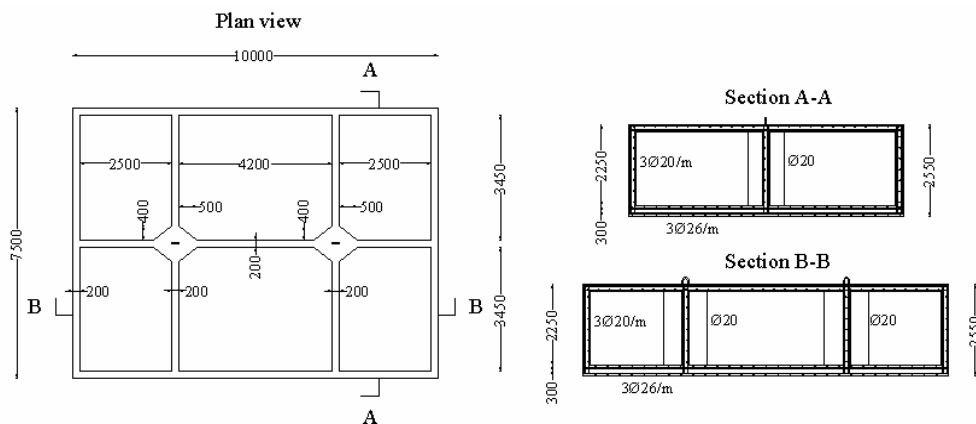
Plan view and sections of the pre-cast foundation: coupled block.
